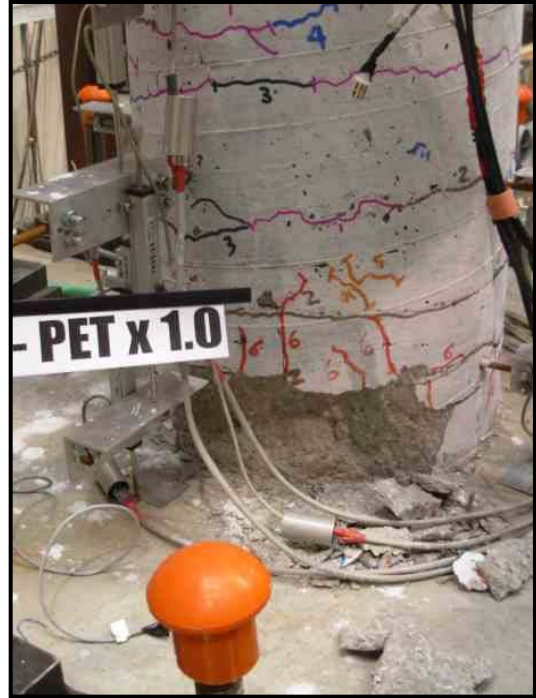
First Concrete Spalling Specimens C1 (PETx1.0)
